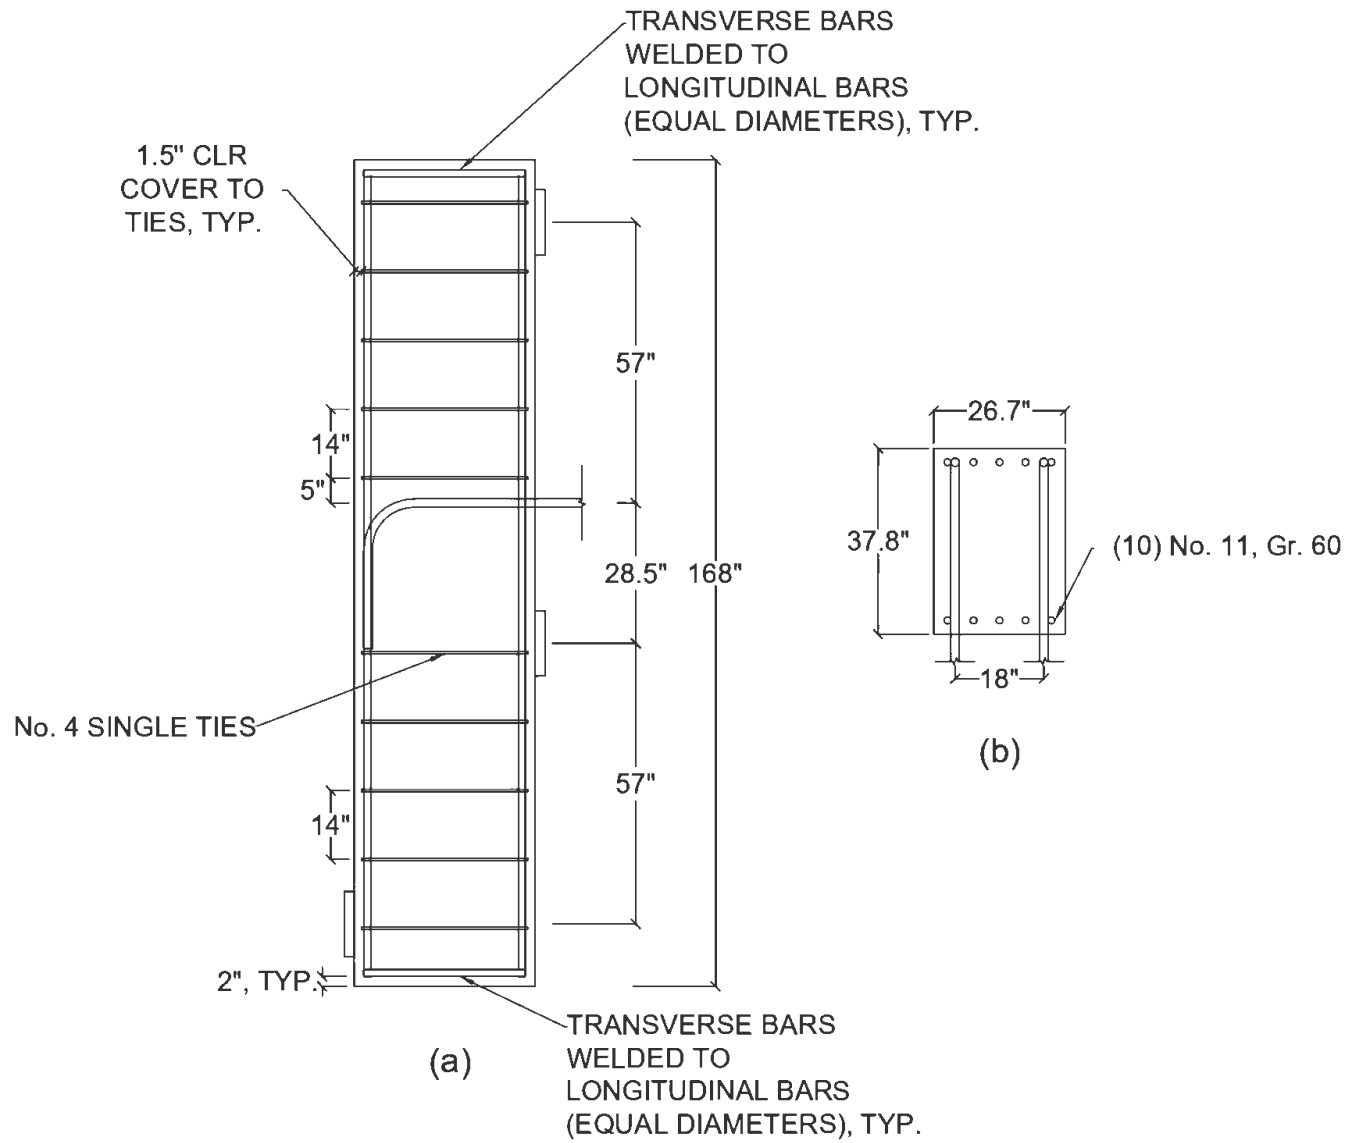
Details of reinforcement layout for No. 14 hooked bar specimen H14-3: (a) elevation, (b) cross-section
